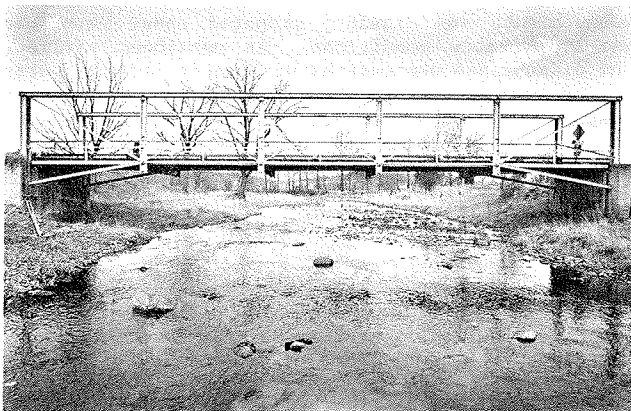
Pony truss bridge, Augusta County, Virginia.
